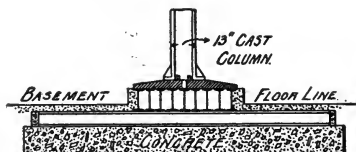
Foundation Detail, Tacoma Building, Chicago.
